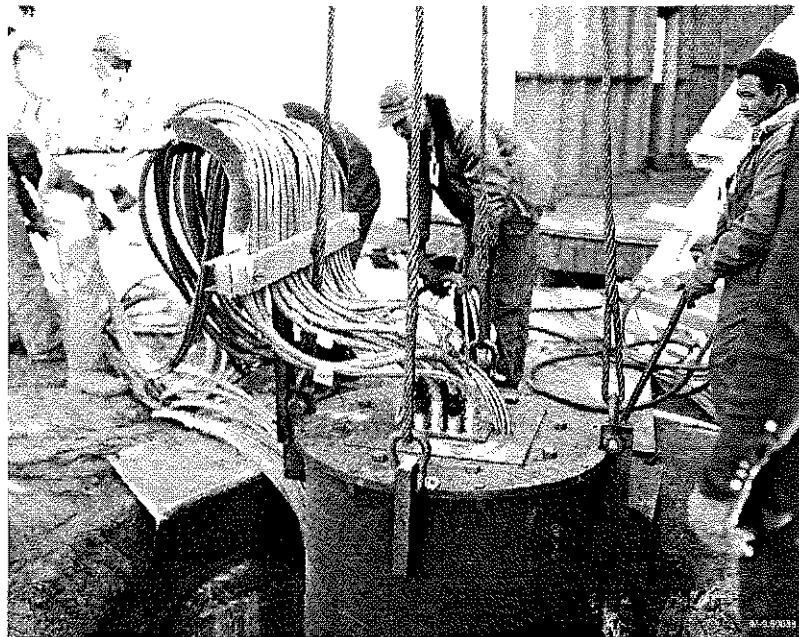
J-6, Assembly Hole 4W, TA-49-Frijoles Mesa
